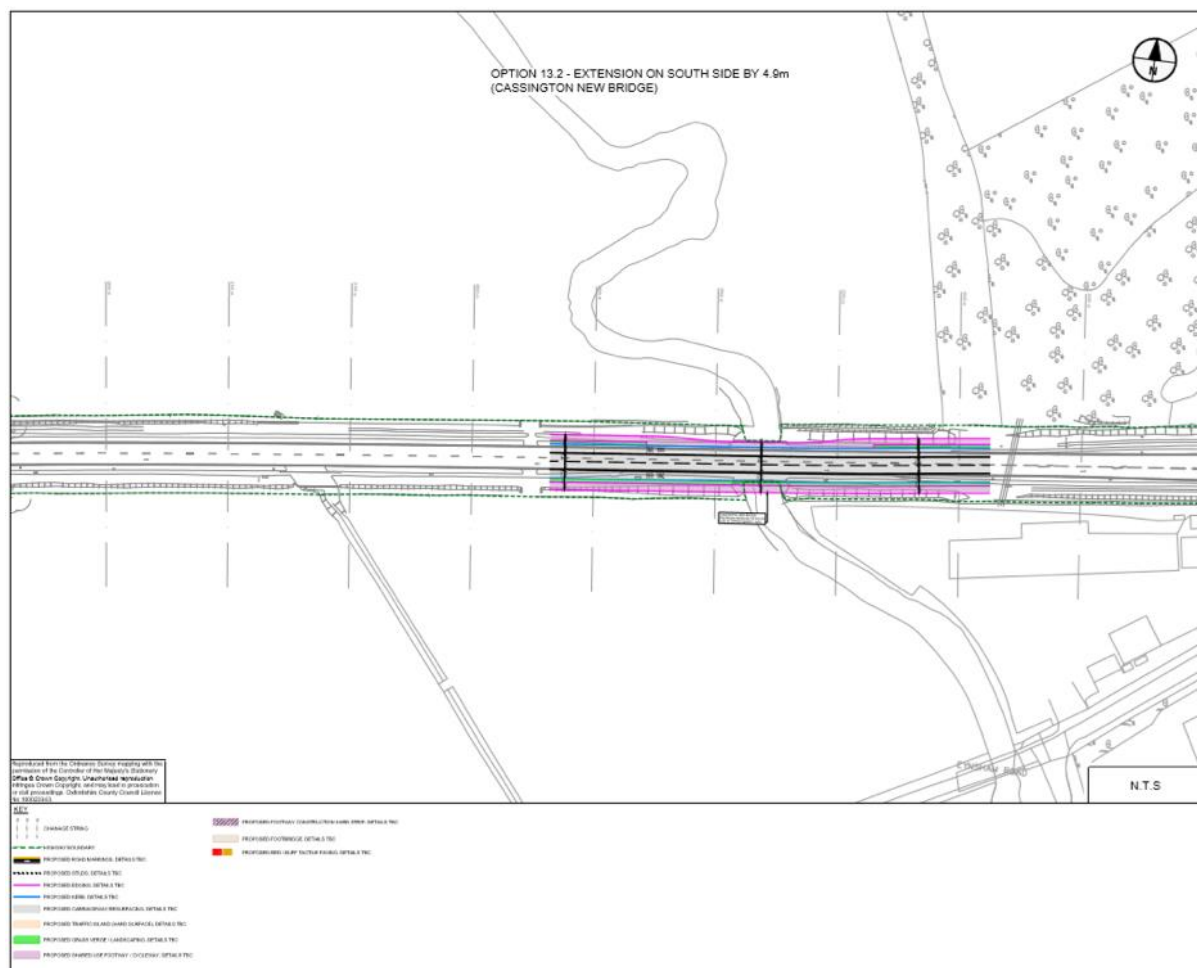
Option 13.2: Widen Bridge on South Side Opt. 2
